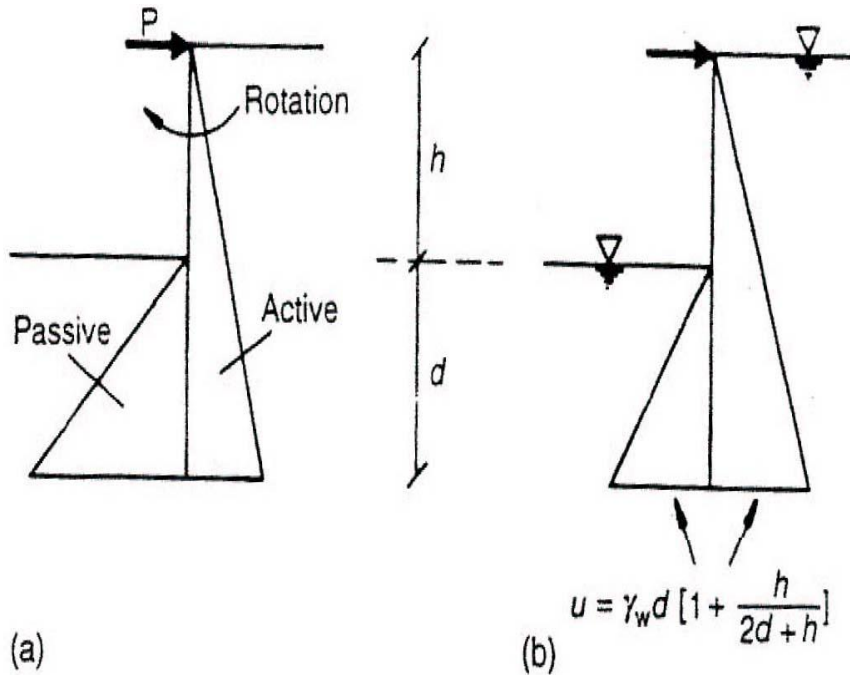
Idealized stress distribution at failure for a stiff wall propped rigidly at the crest; (a) effective stresses; (b) pore water pressures.
